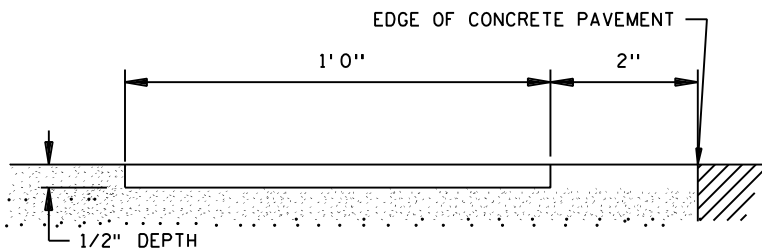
CONCRETE PAVEMENT OPTION B - MODIFIED CONCRETE RUMBLE STRIP
